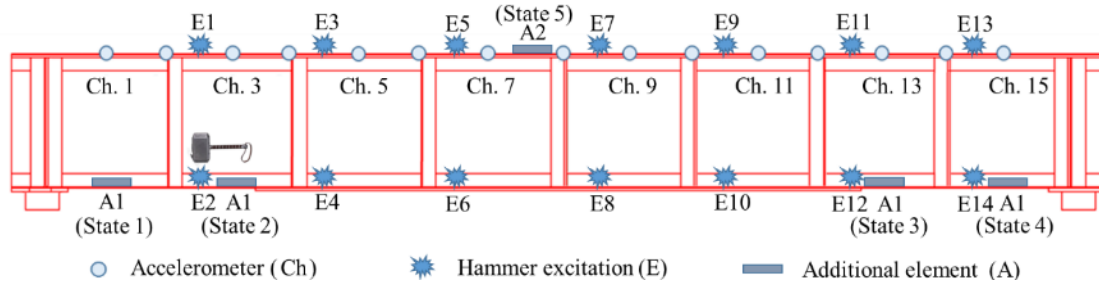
Layout of the short steel girder bridge vibration experiment
